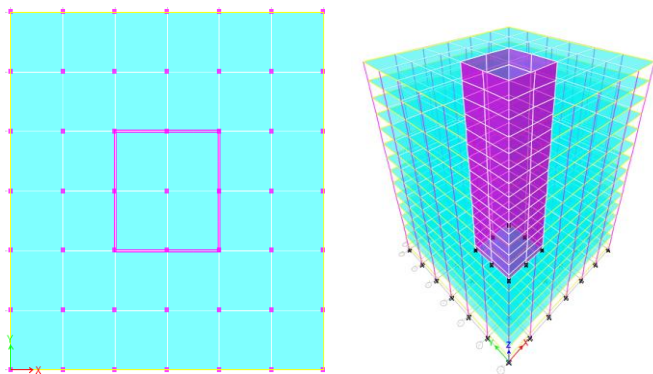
Plan and 3-D View of Model with Box Type Shear Wall
